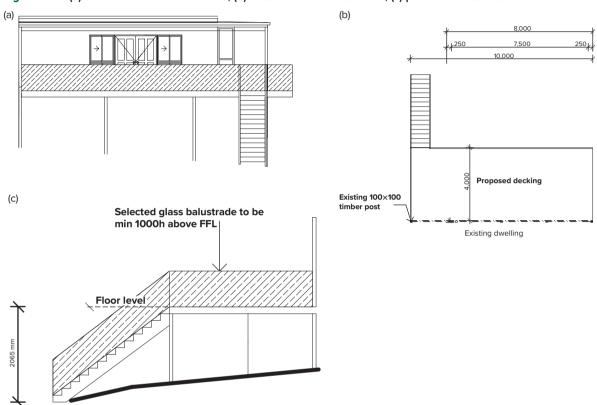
(a) South elevation of staircase; (b) east elevation of staircase; (c) plan view of staircase
